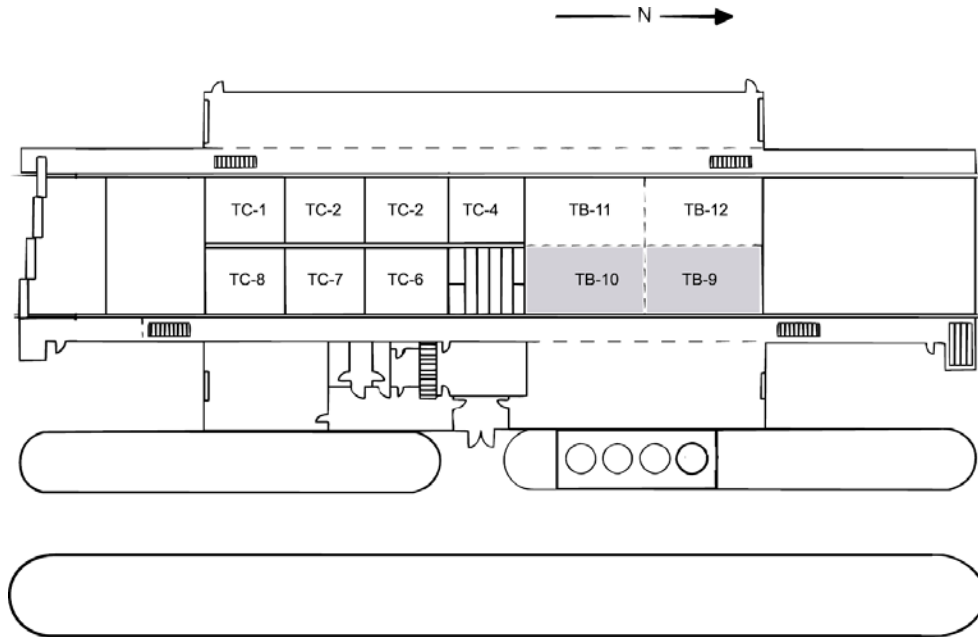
Plan section of the Frost Effects Research Facility.
